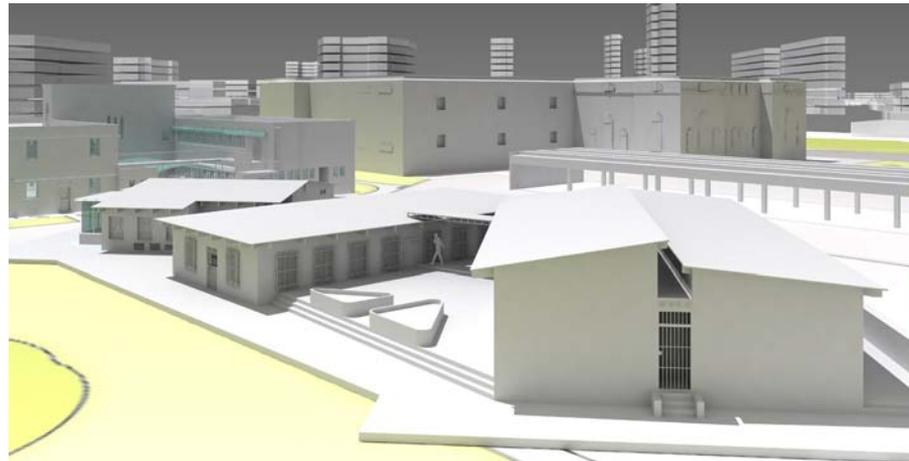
View of Bateman, Vetman and Stoneman buildings from the Southeast
